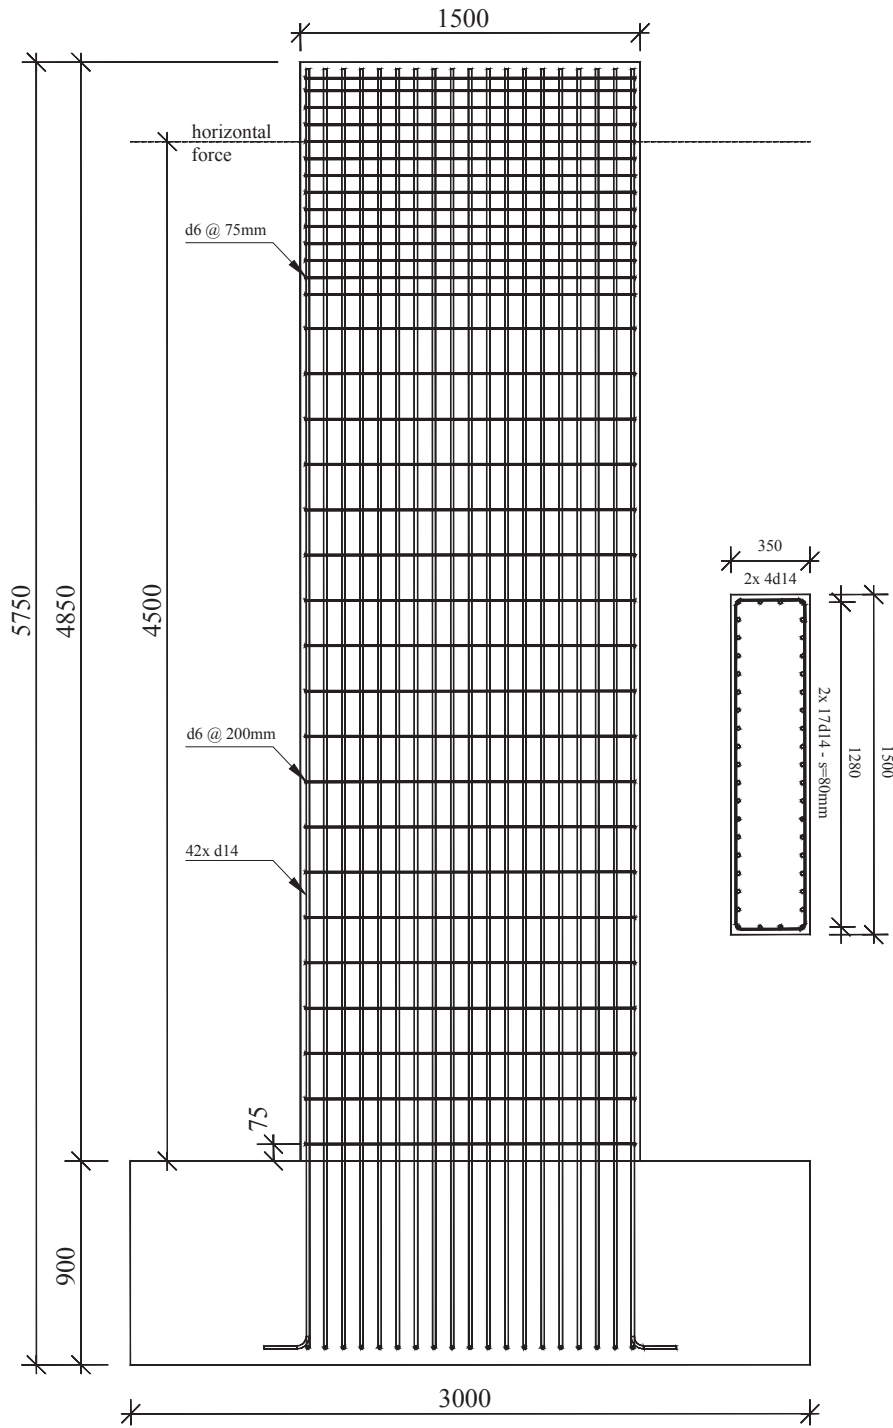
Reinforcement layout - elevation and cross section of test unit VK6. All dimensions in [mm].
